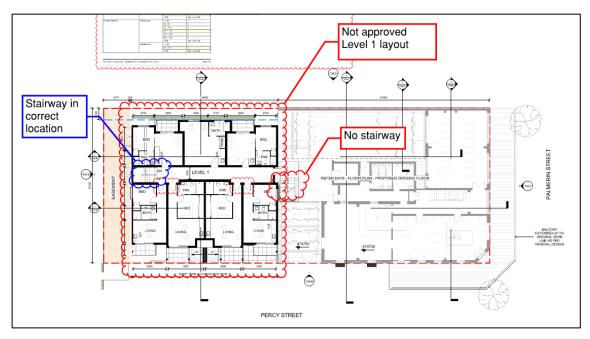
Floor Plan - Proposed Level 1 (Room/unit layout incorrect) (Amended by Council 19 August 2024)
